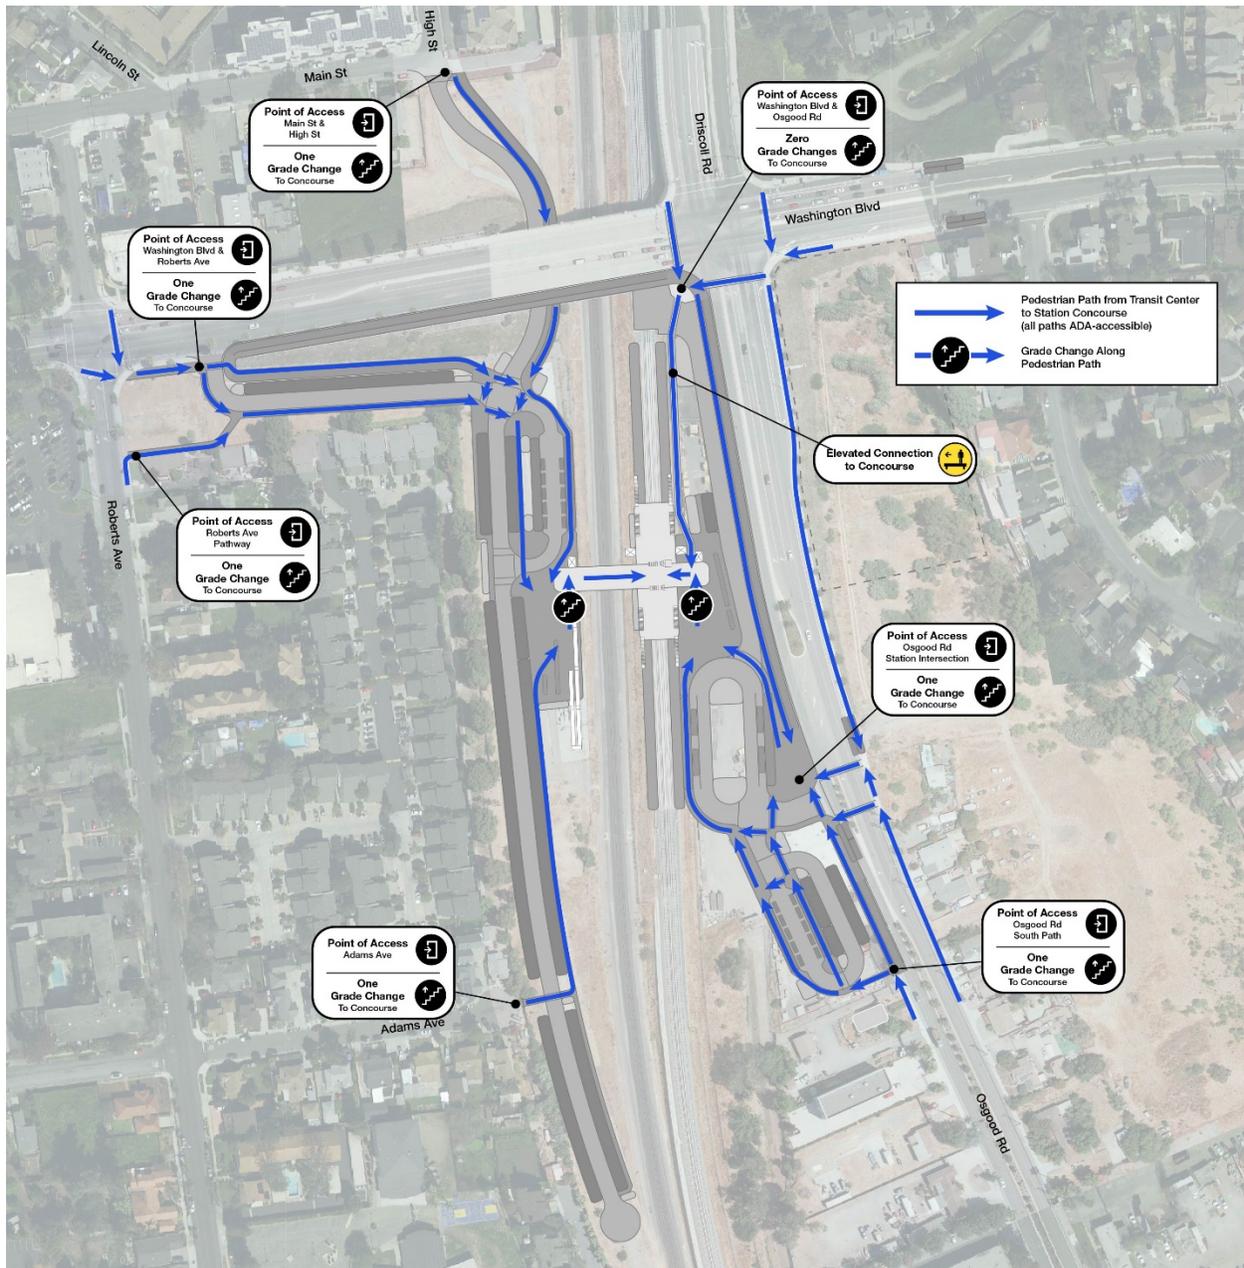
Station Site Pedestrian Access Points and Paths- Alternative B
